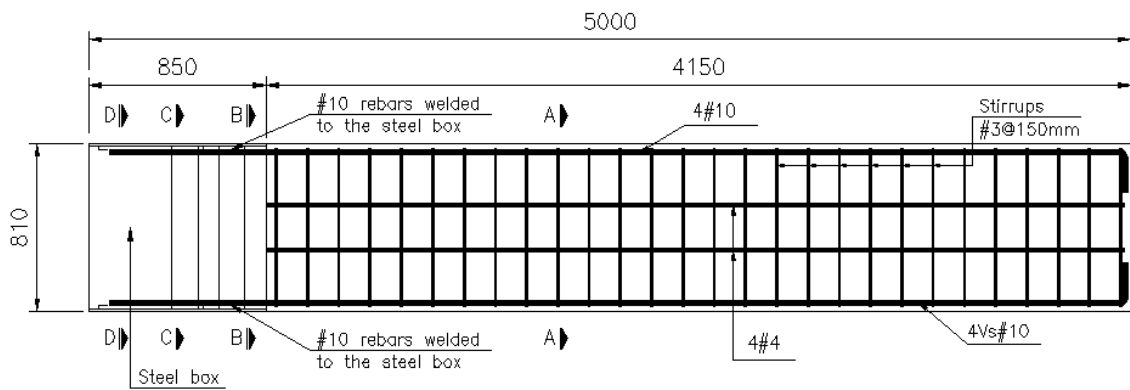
Geometry of specimen P-SD-1, dimensions in mm.
